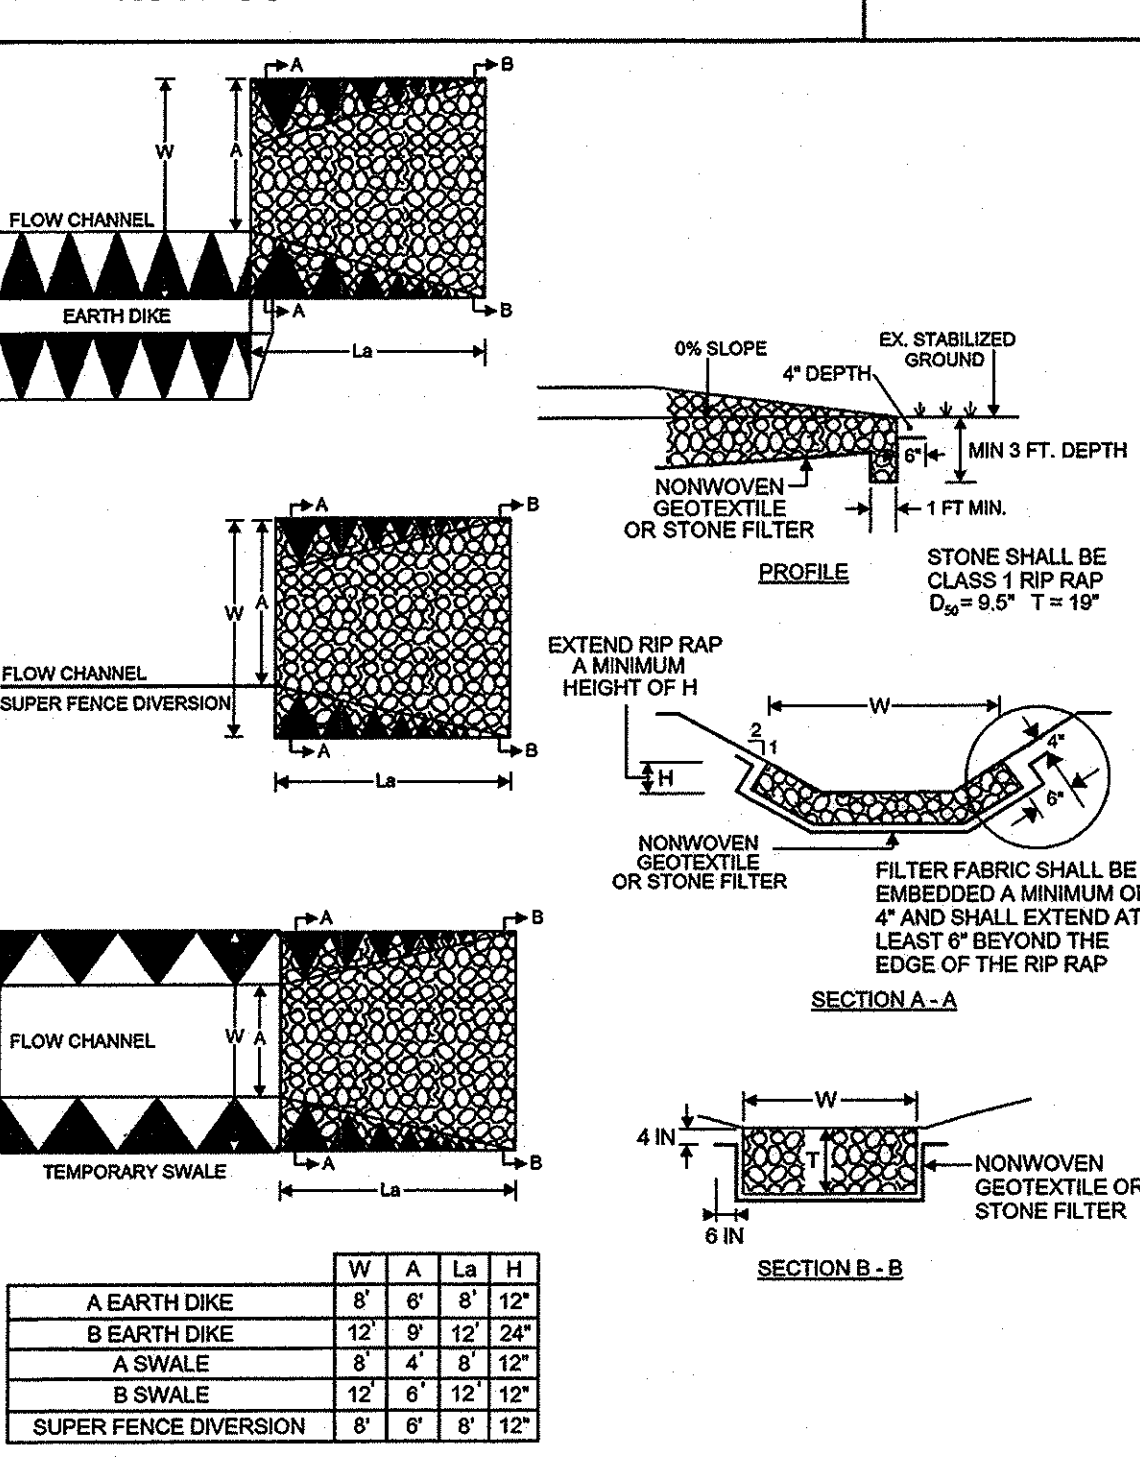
C ROCK OUTLET PROTECTION III
